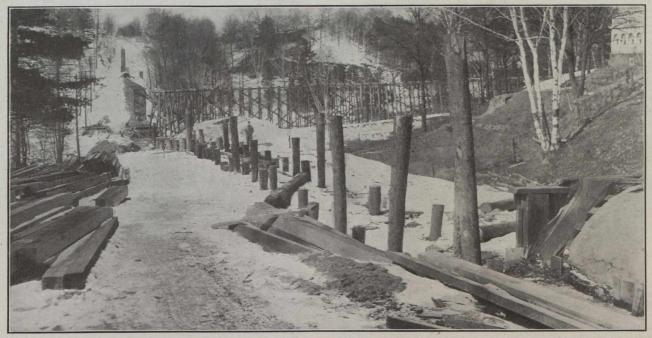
Early Construction Operations at Bloor Street and Clendennan Avenue, Showing Piling to Support Timber Trestle to Carry the Bloor Street Line Westward and the Clendennan Avenue Branch Northward.
